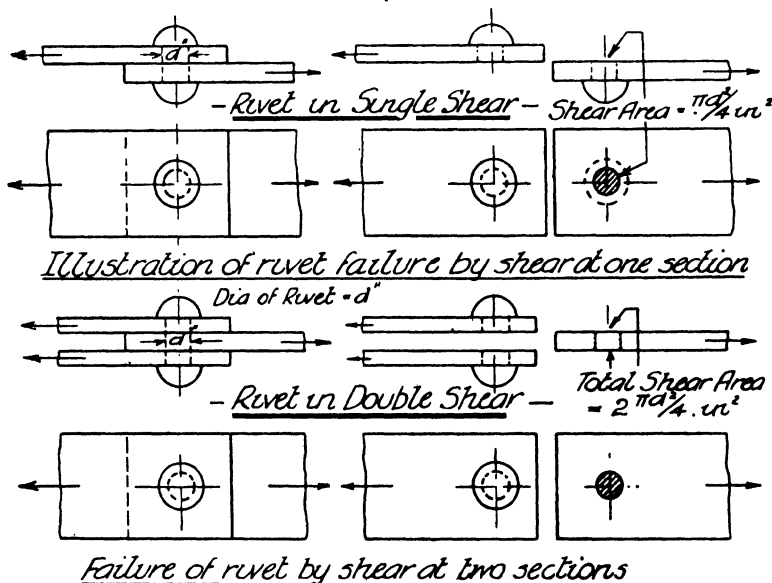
SINGLE SHEAR AND DOUBLE SHEAR IN A RIVET OR BOLT.
